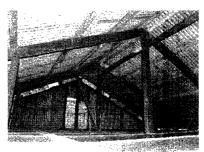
Antechamber Fig 10. Living room Fig 11. Roof Structure
